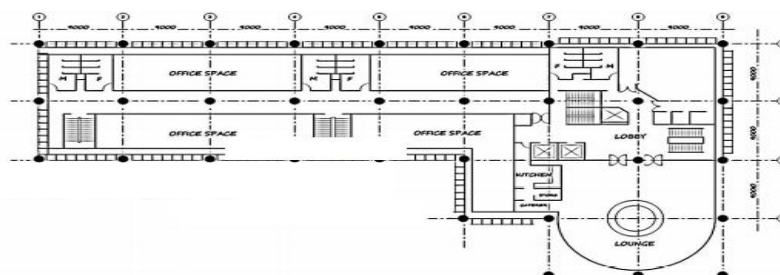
First floor plan of Unilag Senate House (Source – Author’s field work)
